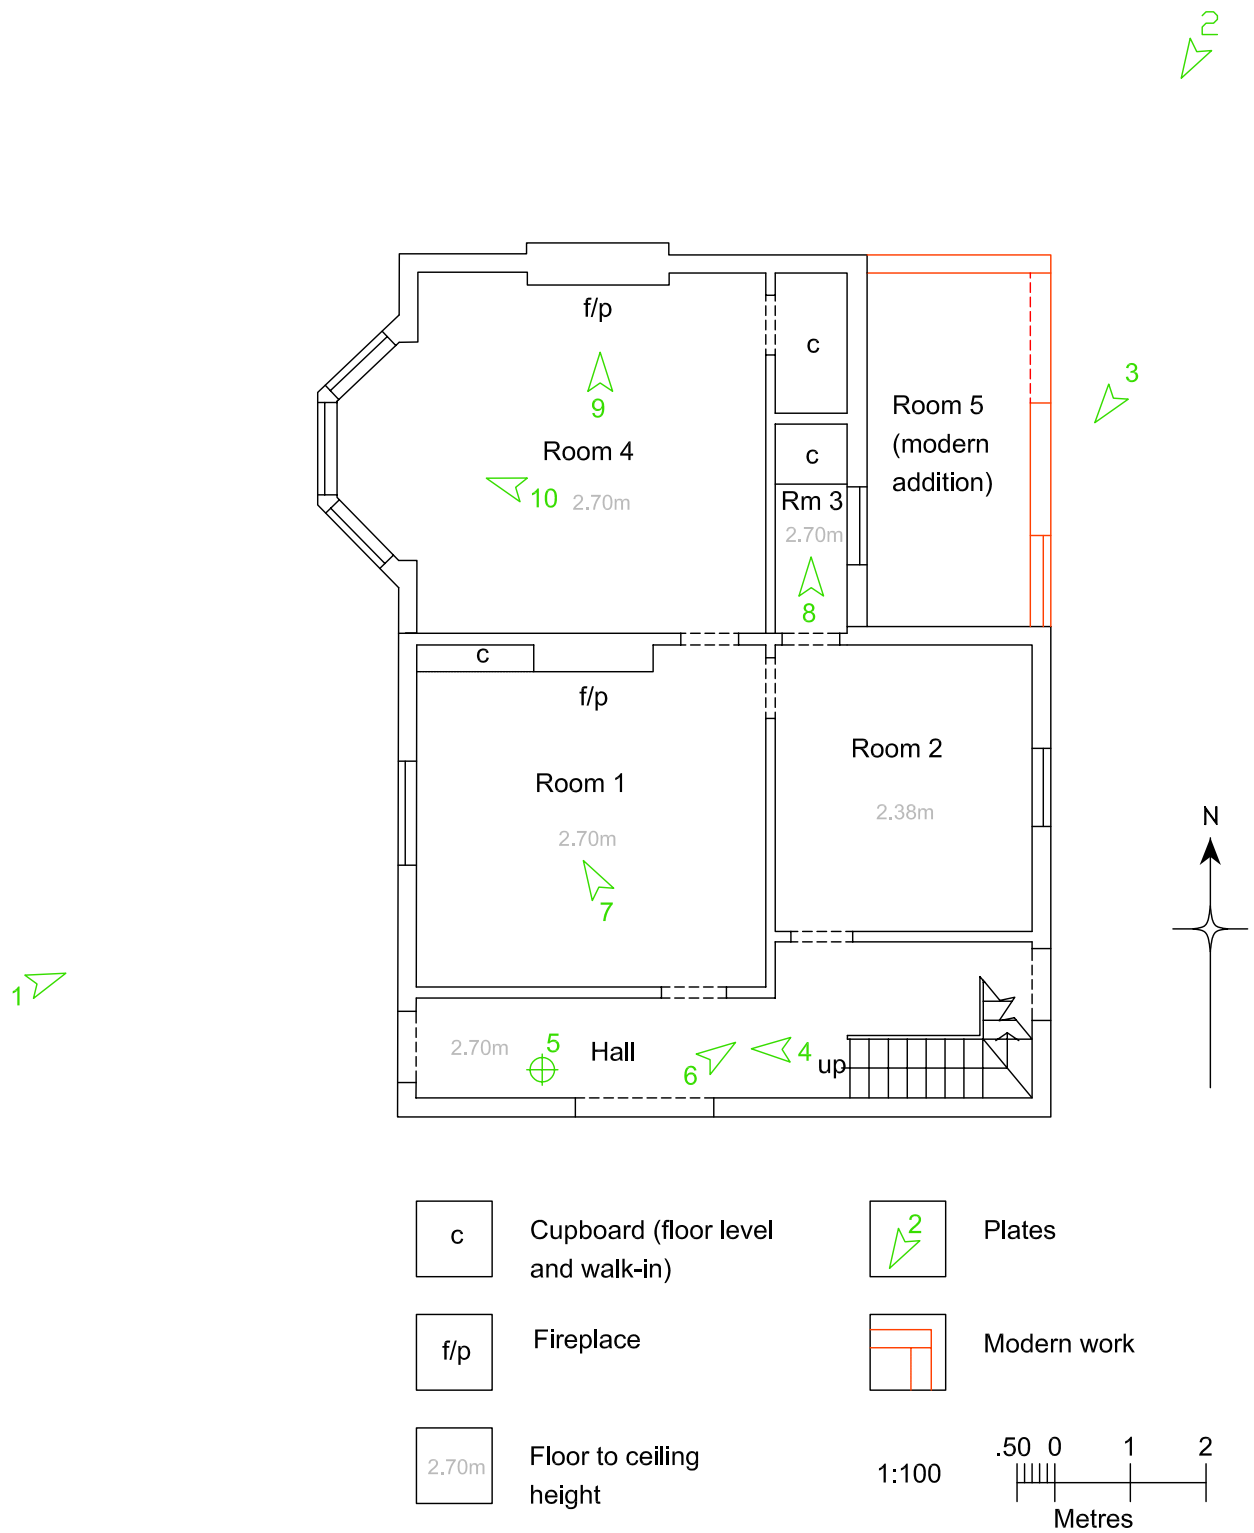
Ground-floor plan of the farmhouse (Ilford House)
